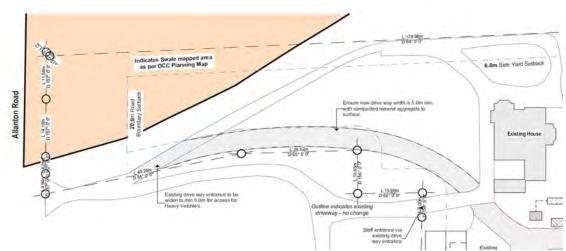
Excerpt from Site Plan Showing Existing and Proposed Driveways.
